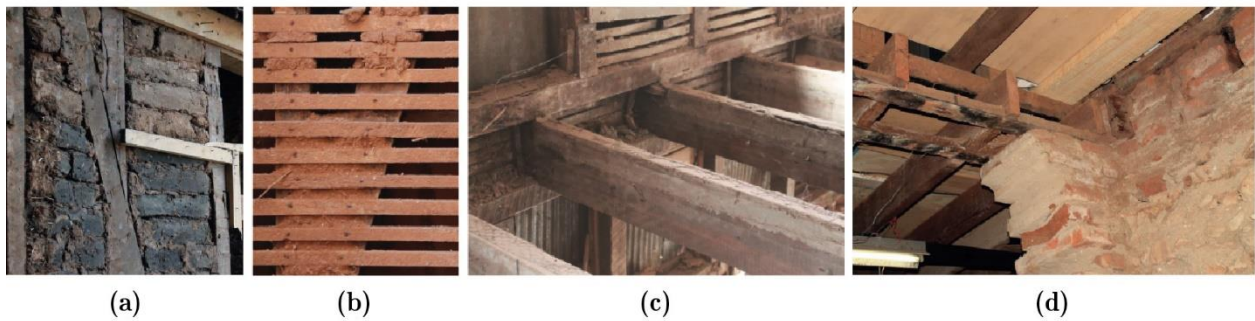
Typical timber structure configurations in Valparaíso: (a) external wall filled with adobe, (b) internal wall of lath and plaster, (c) connection of timber story to the walls and (d) connection of timber story to the brick strip footing foundation.
